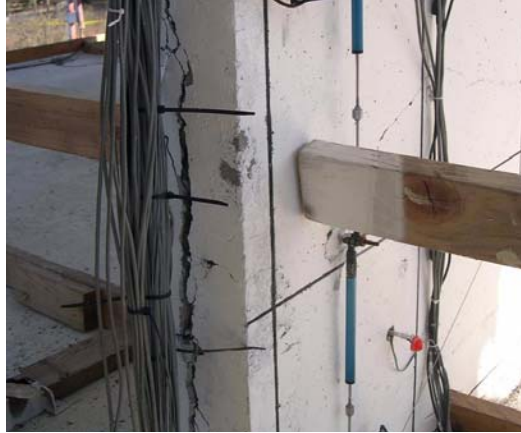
Splitting crack due to lap-splice failure at the bottom of the second story of the web wall on the west side at state S4 (after EQ4)
